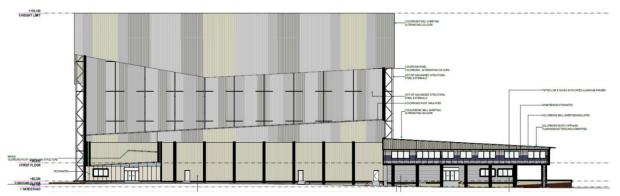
Southeast elevation of proposed high impact industry and warehouse on Lot 12.
